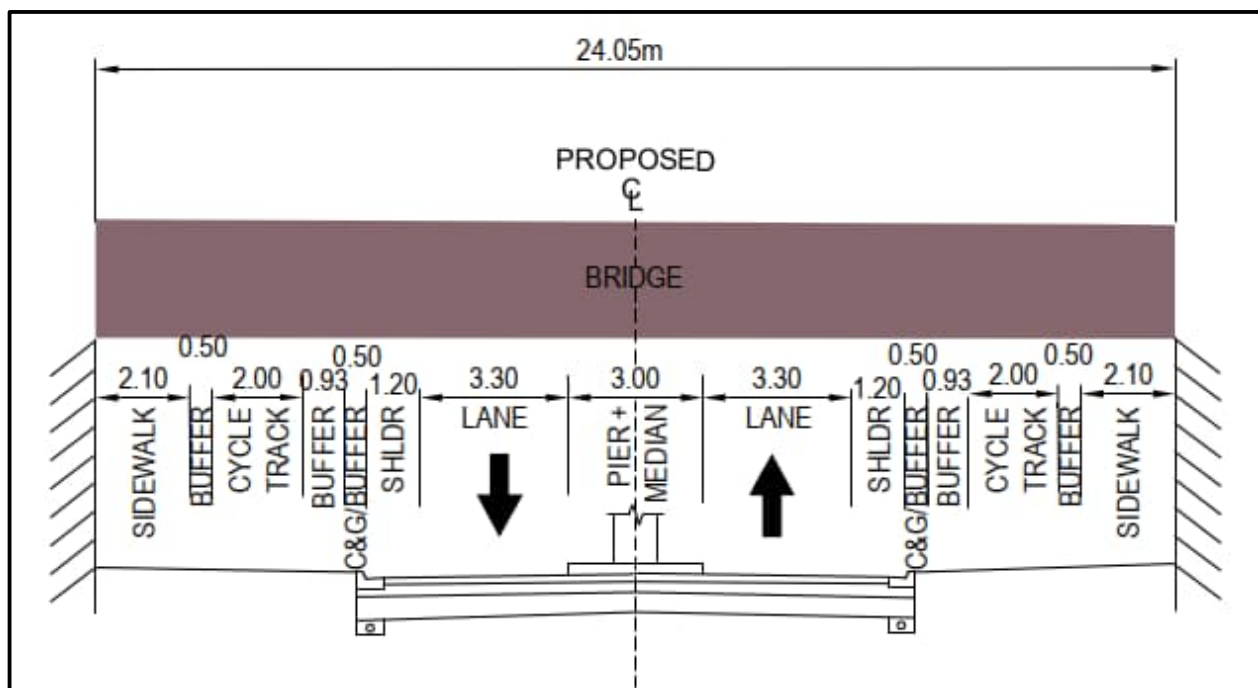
Park Lawn Road Improvements, North of Gardiner Expressway to On-Ramp – Typical Concept Cross-section
